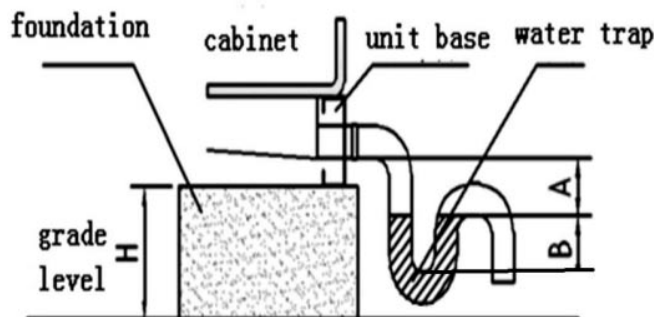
Schematic Diagram –Condensate Water Drainage Pipe Installation
